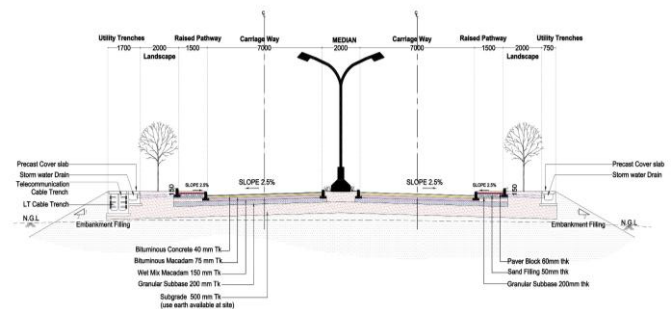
Prototype of main access road with 14M width with trenches for Low tension cables with telecommunication trench and trench for storm water drain collected from the roads provided with 2.5% slope to the raised pathway.
